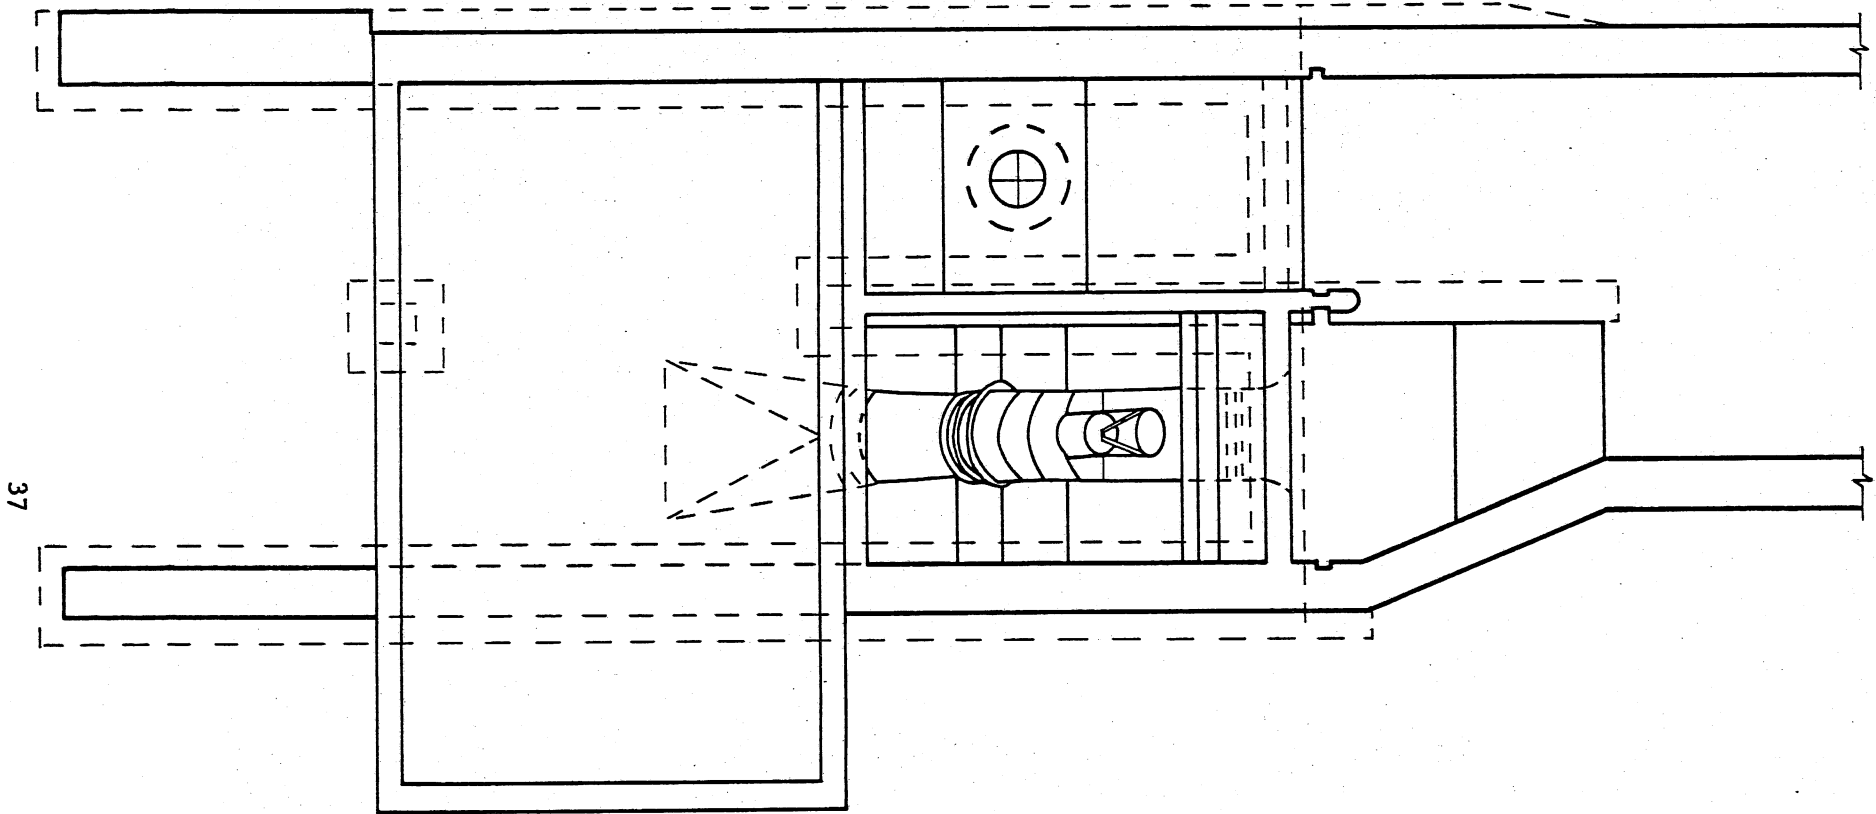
Section view of Alternative B: one inclined tubular unit with 30-inch diameter axial runner.
